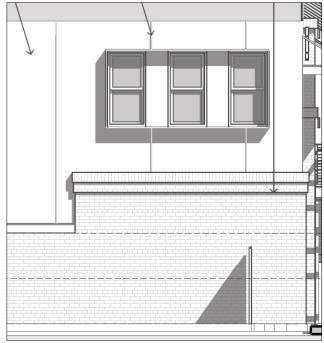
Brick veneer on the west elevation breaks up stucco wall and again creates a cornice.
